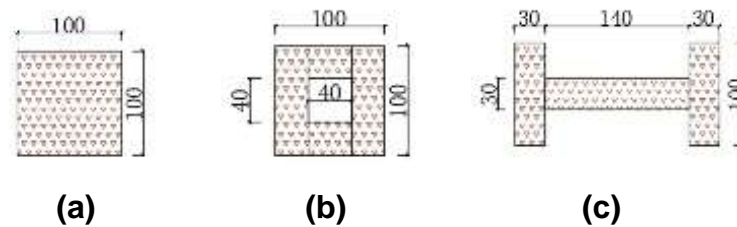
Sectional dimensions of bamboo scrimber specimens: (a) Solid section; (b) Hollow section; (c) I-shaped section (This information appeared earlier in (Su 2017))
